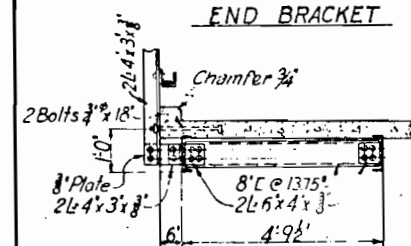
DETAIL OF SIDEWALK FOR SOUTH TRUSS
